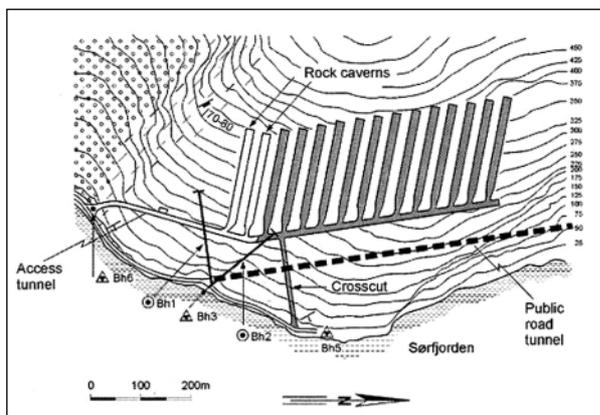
Schematic layout of the disposal caverns in Odda (Myrvang 1996)a
